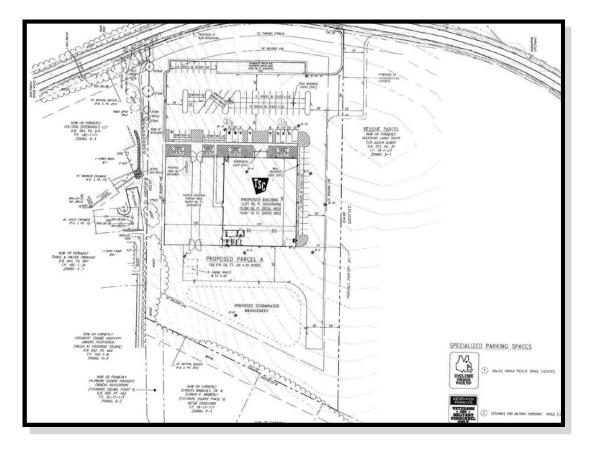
Sketch Plan for Tractor Supply Co. on South Boston Road (SDP 19:20).
